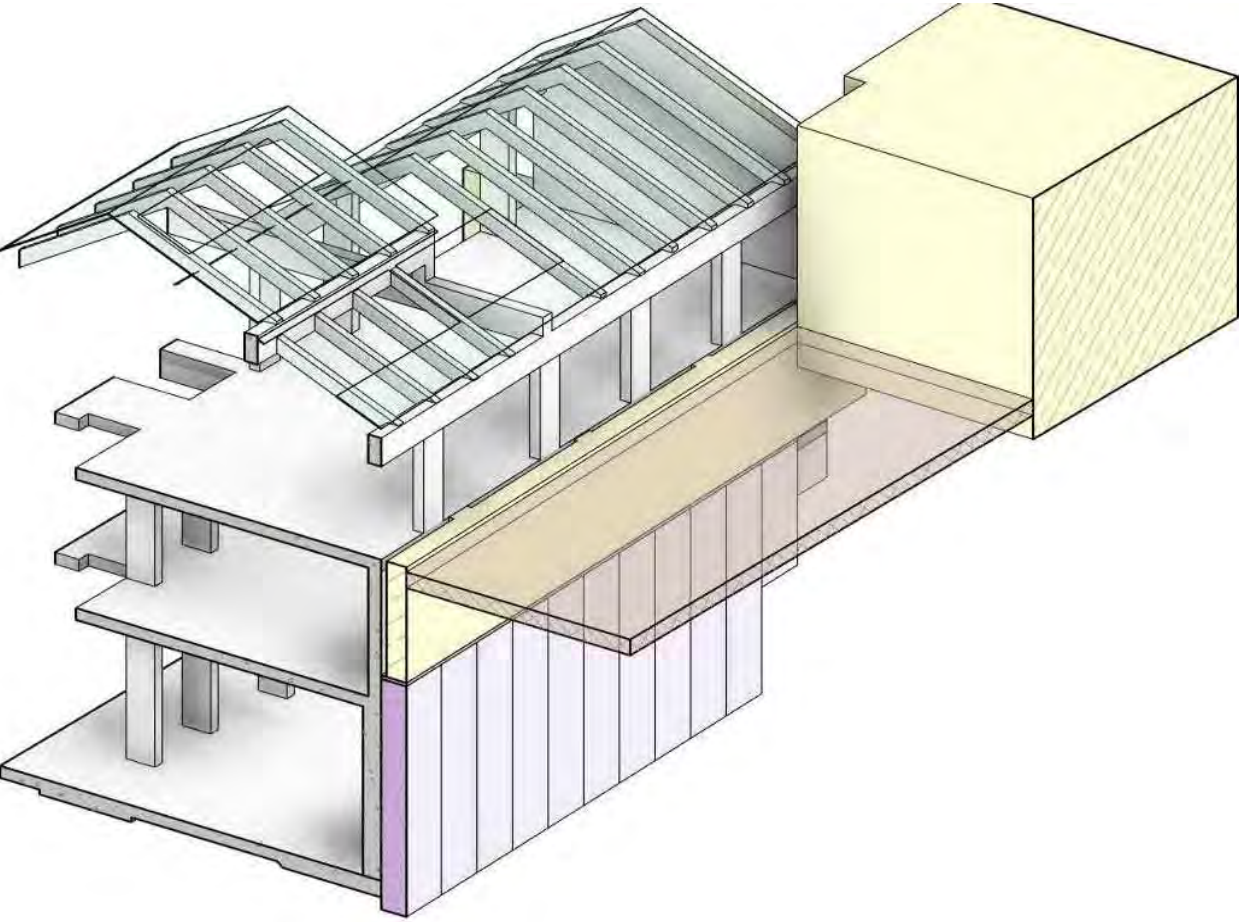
Transverse section showing underpins (purple) to boundary wall and internal concrete liner wall box construction
